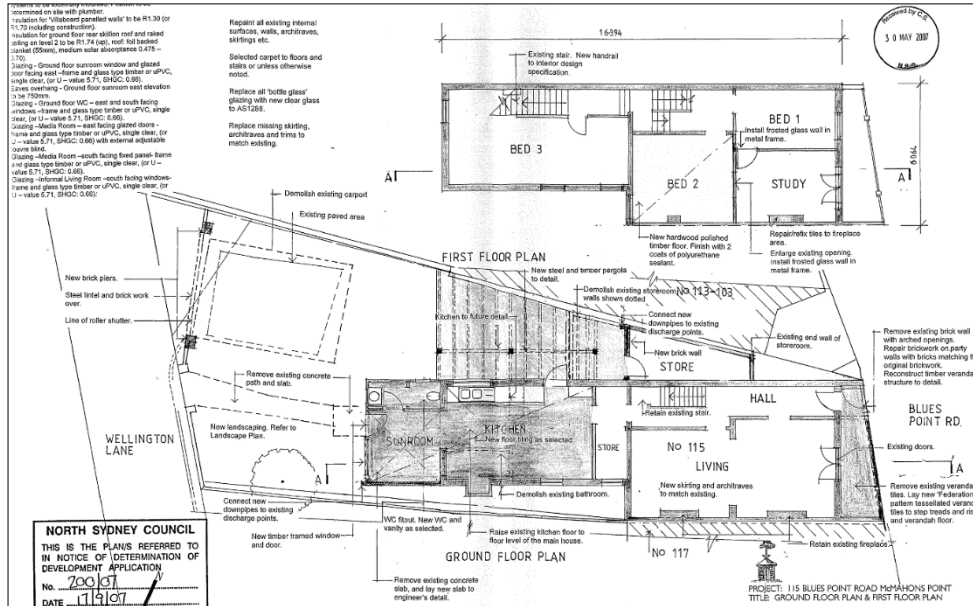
Approved Ground and First Floor DA200/07 showing demolished carport, although no garage proposed
